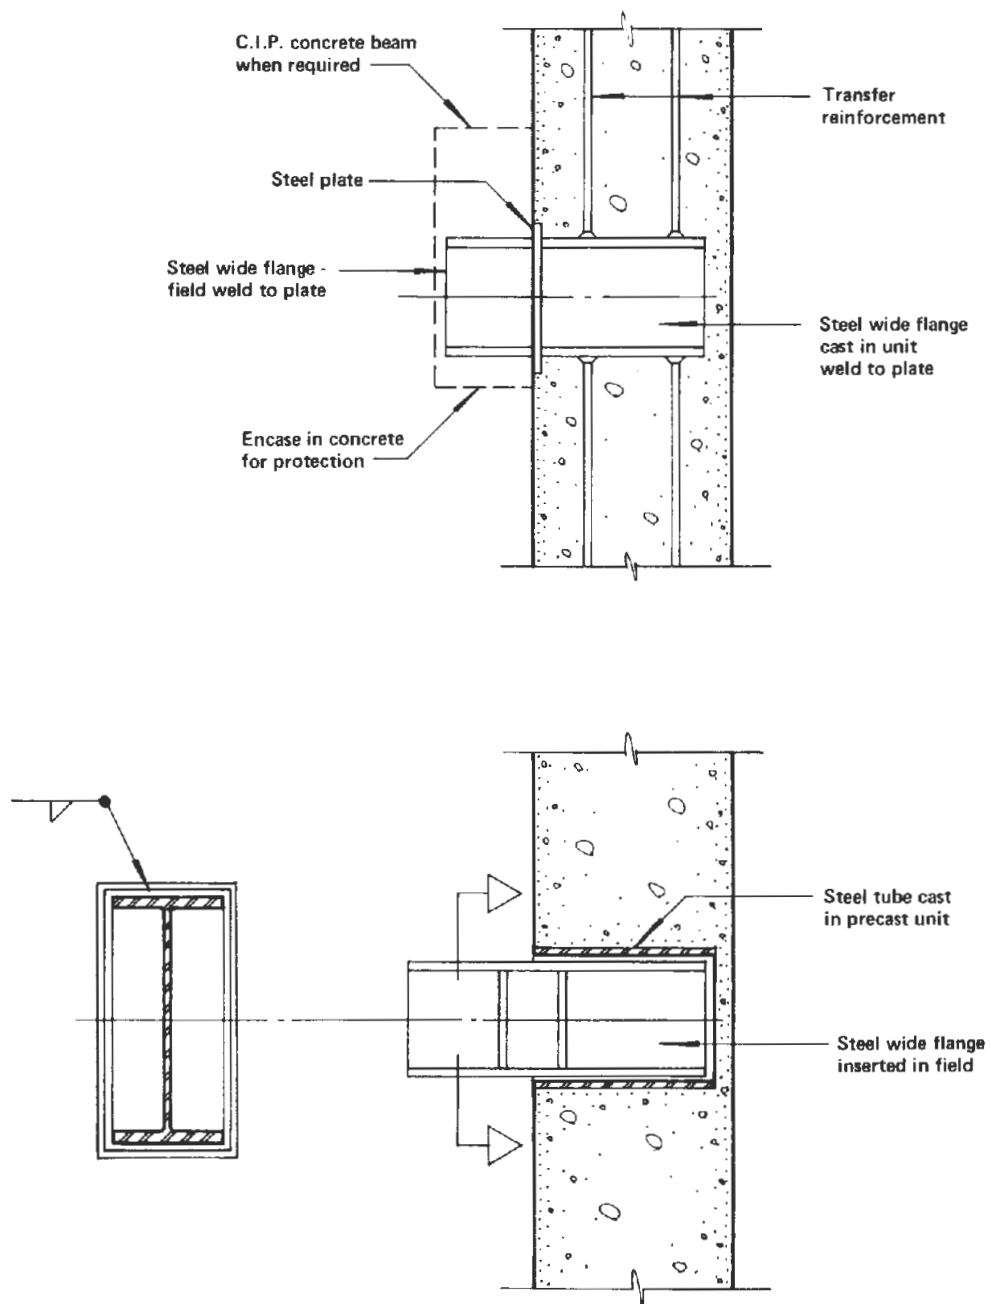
Examples of connections using haunches which are constructed after the vertical element is in place.
